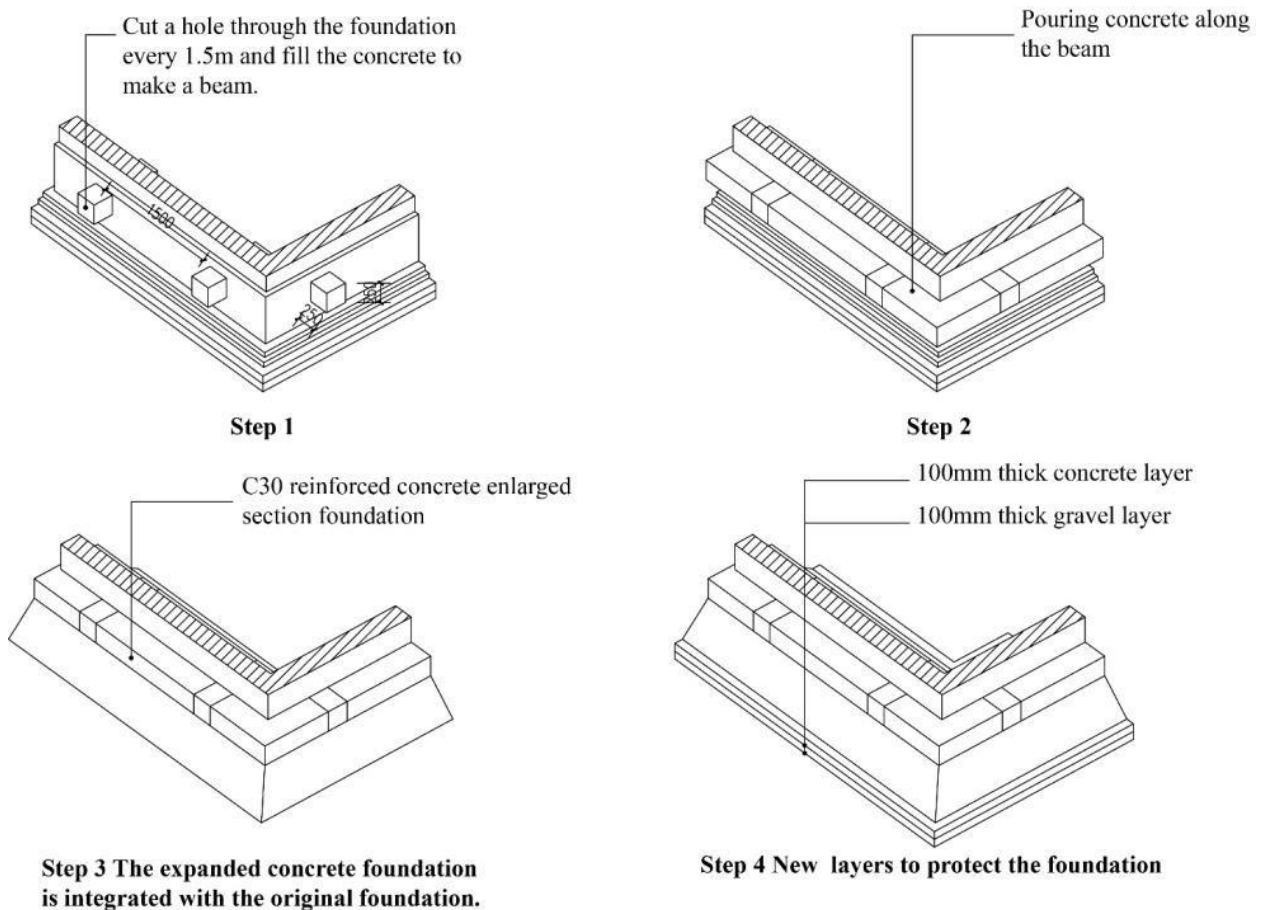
Building foundation reinforcement step (Image source: Professor Zhou Qi's studio at the School of Architecture, Southeast University)
